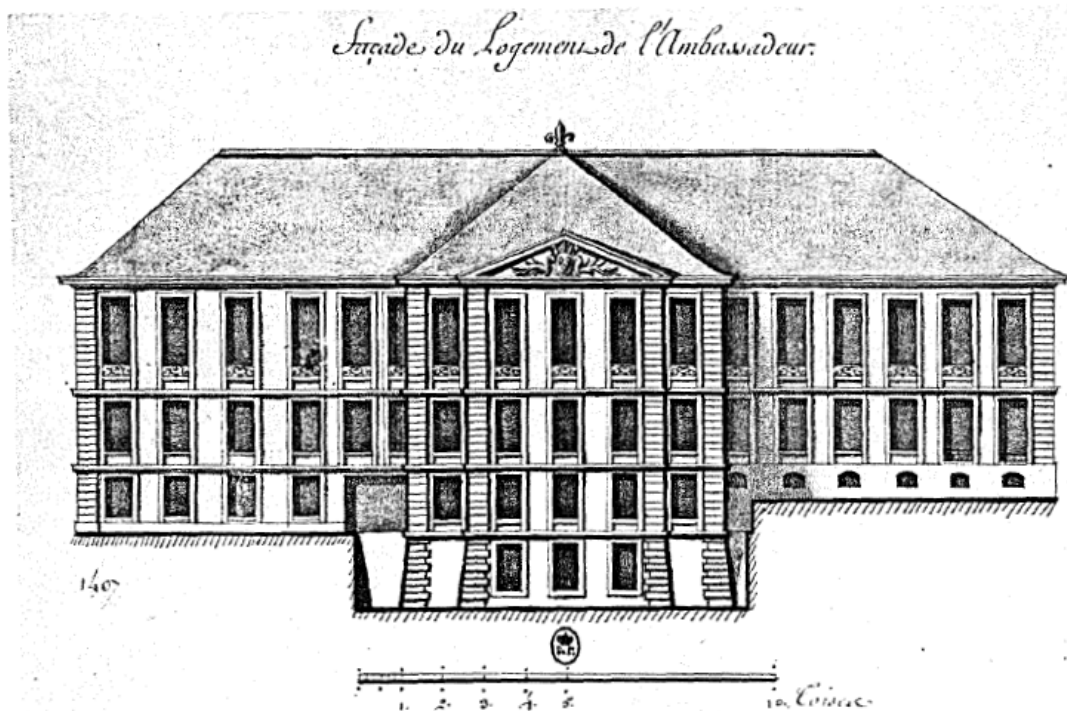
Pierre Vigné de Vigny, revised elevation of the proposed rebuilding of the Palais de France, c. 1722. BnF, Estampes, Ha. 18a. 2.95.
